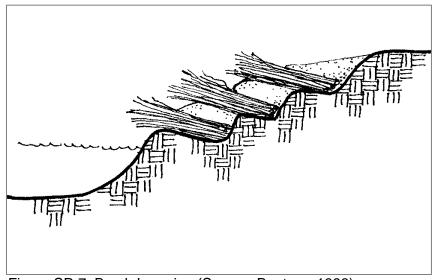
Brush Layering (Source: Bentrup, 1998)
